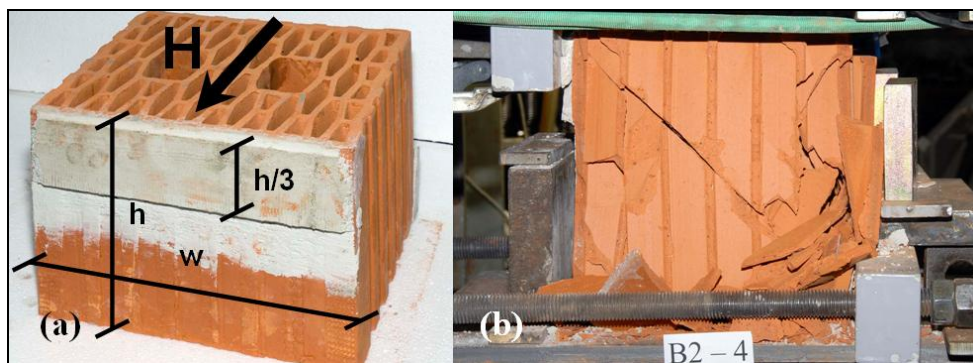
Hollow block type B2 ready for shear test (a) and (b) hollow block type B2 after the shear test
